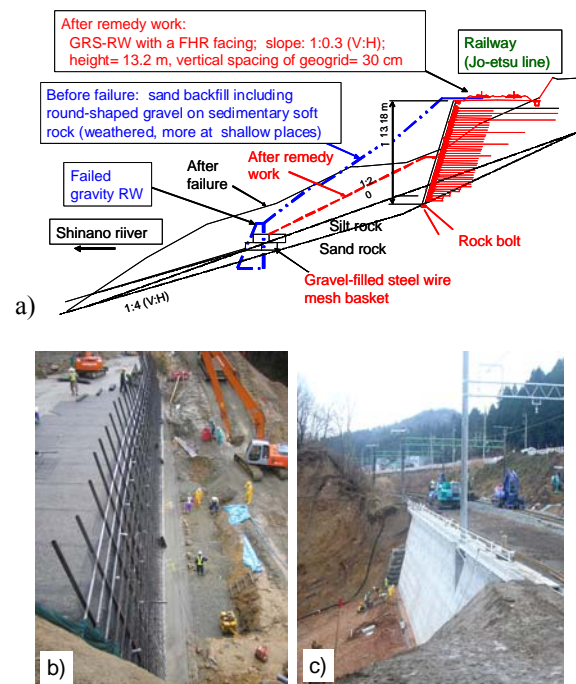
a) Railway embankment that collapsed during the 2004 Niigata-ken Chuetsu Earthquake and its reconstruction to a GRW RW having FHR facing; b) the wall during reconstruction; and c) the completed wall, Jo-etsu line, East Japan Railway Co. (Morishima et al., 2005).
